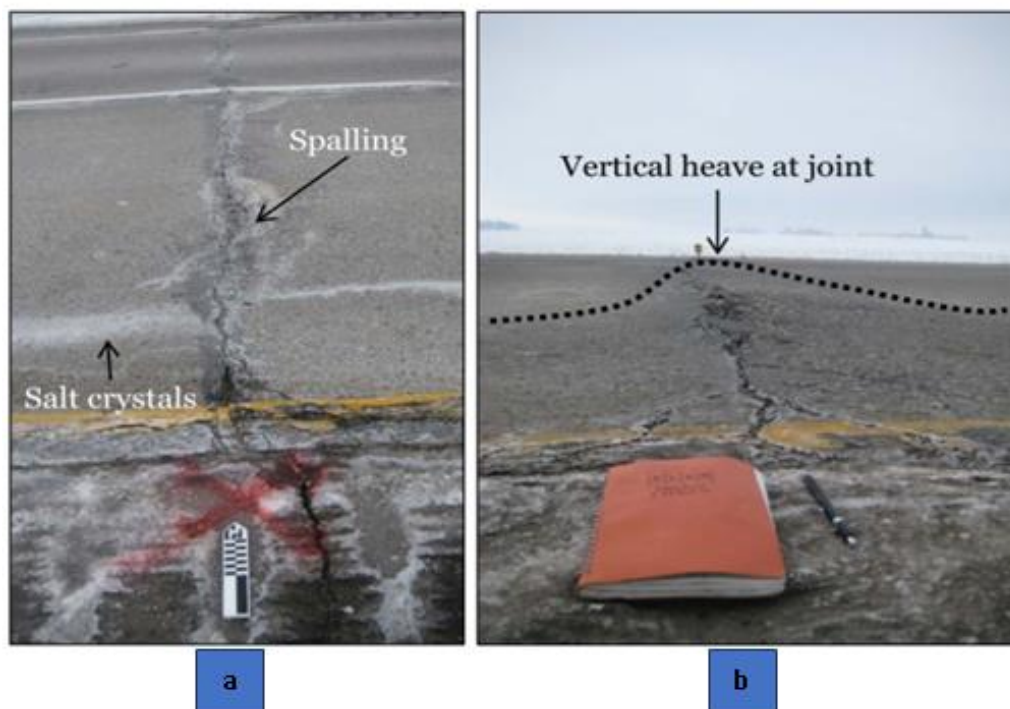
Damage due to frost (a) joint deterioration with spalling; (b) vertical heave at joint location of road (Zhang et al. 2018)
